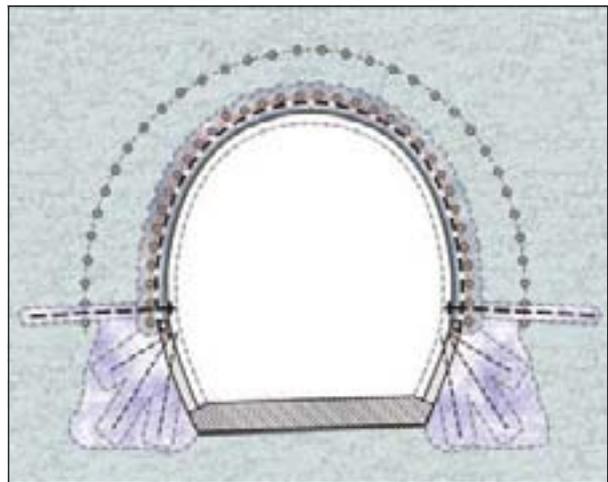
Example of a normal profile when using pipe screens at a cross section of a tunnel
